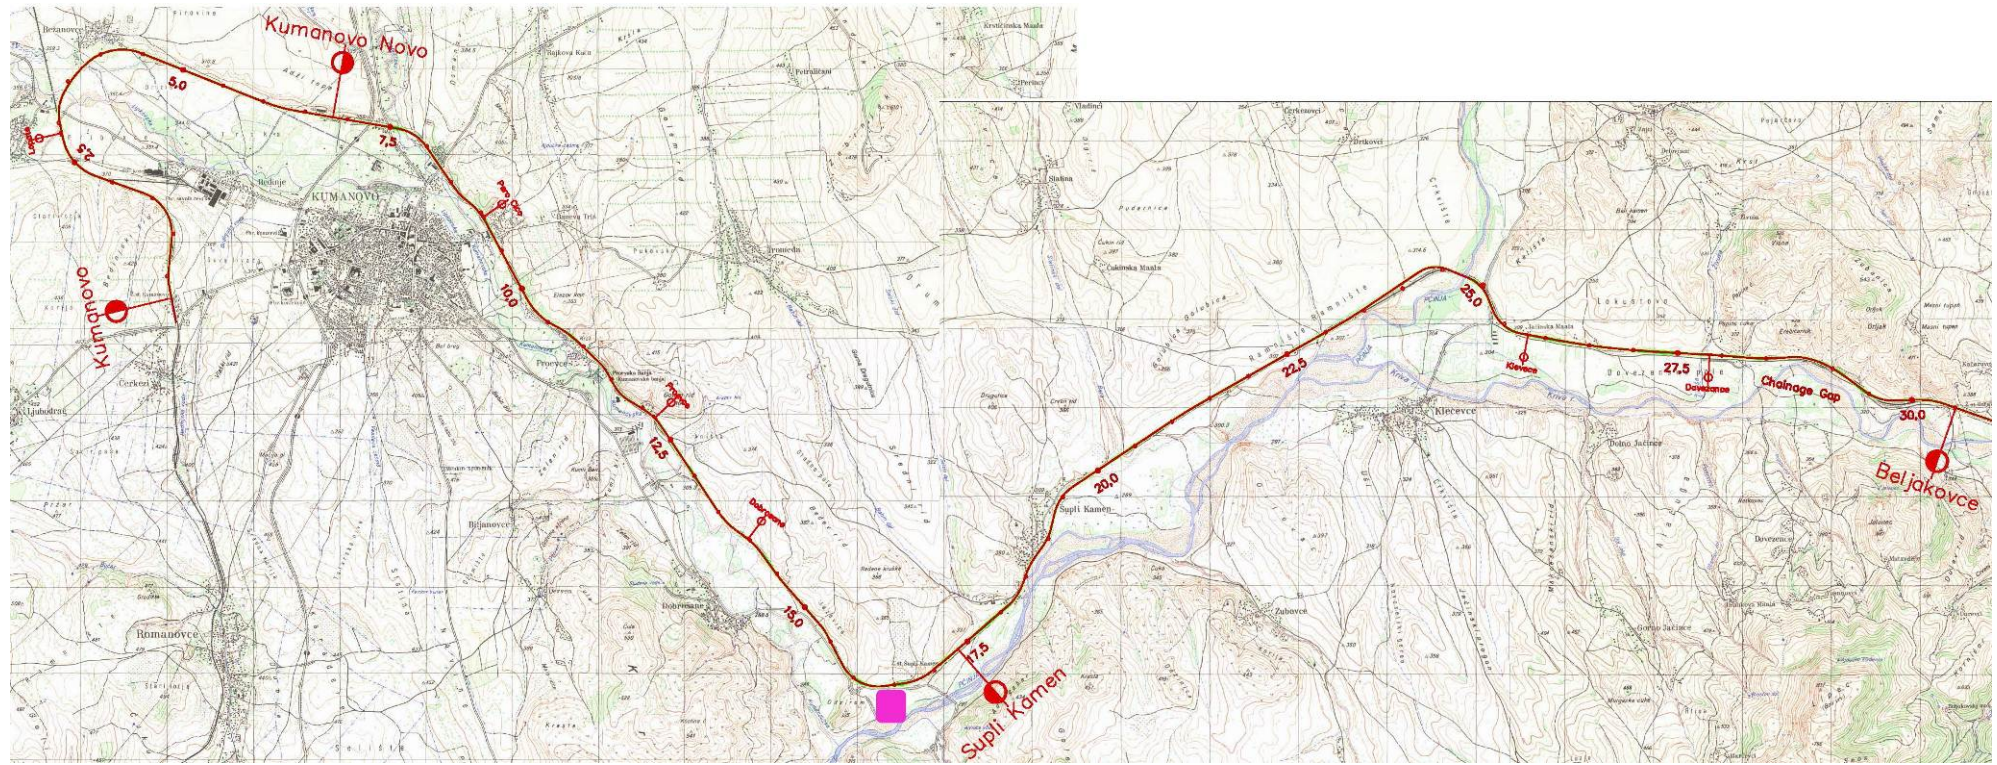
Location of Previous Concrete Batching Plant in Section 1
